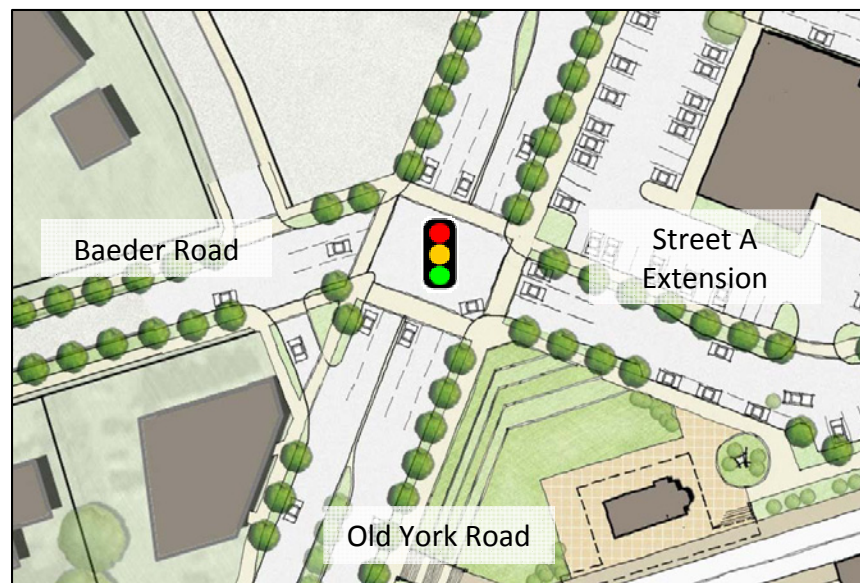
Conceptual Drawing of Old York Road, Baeder Road, and Street A Intersection
